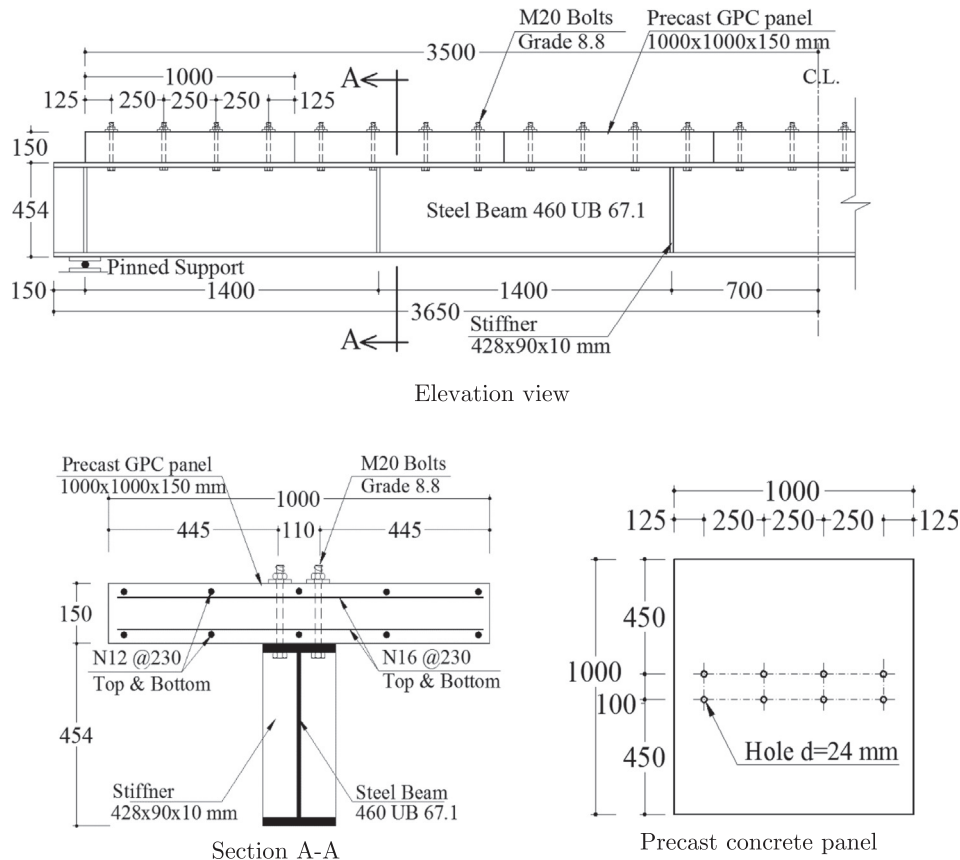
Geometry and details of composite beam CB2 (unit: mm).
